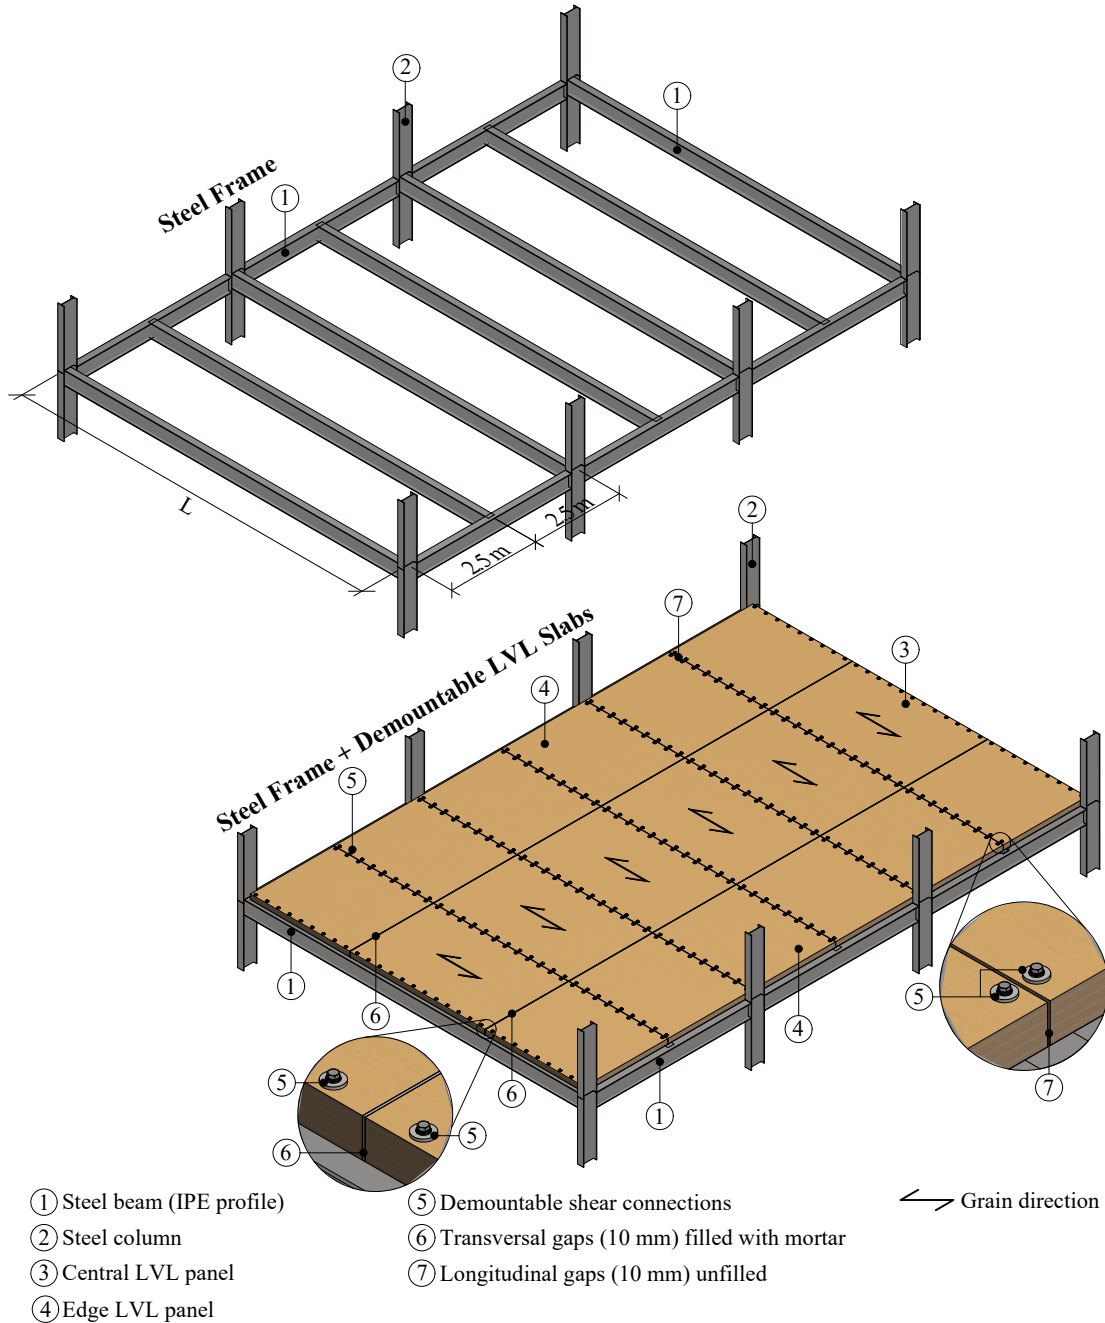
Demountable steel-timber composite (STC) flooring system.
